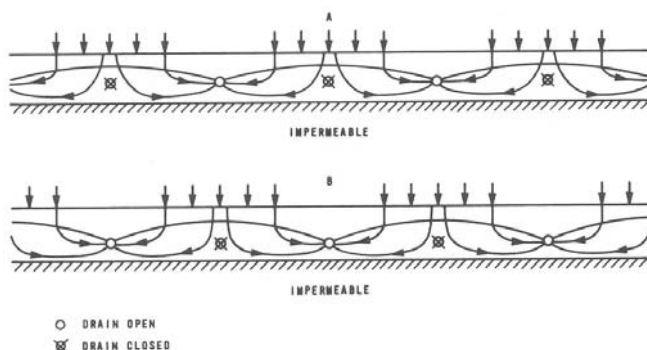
Underdrain System Using Alternating Infiltration and Drying Strips.
